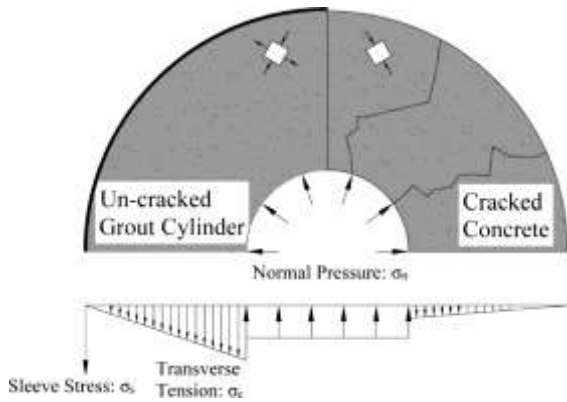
Stress state inside a corrugated sleeve grouted connection versus cracked concrete cylinder
